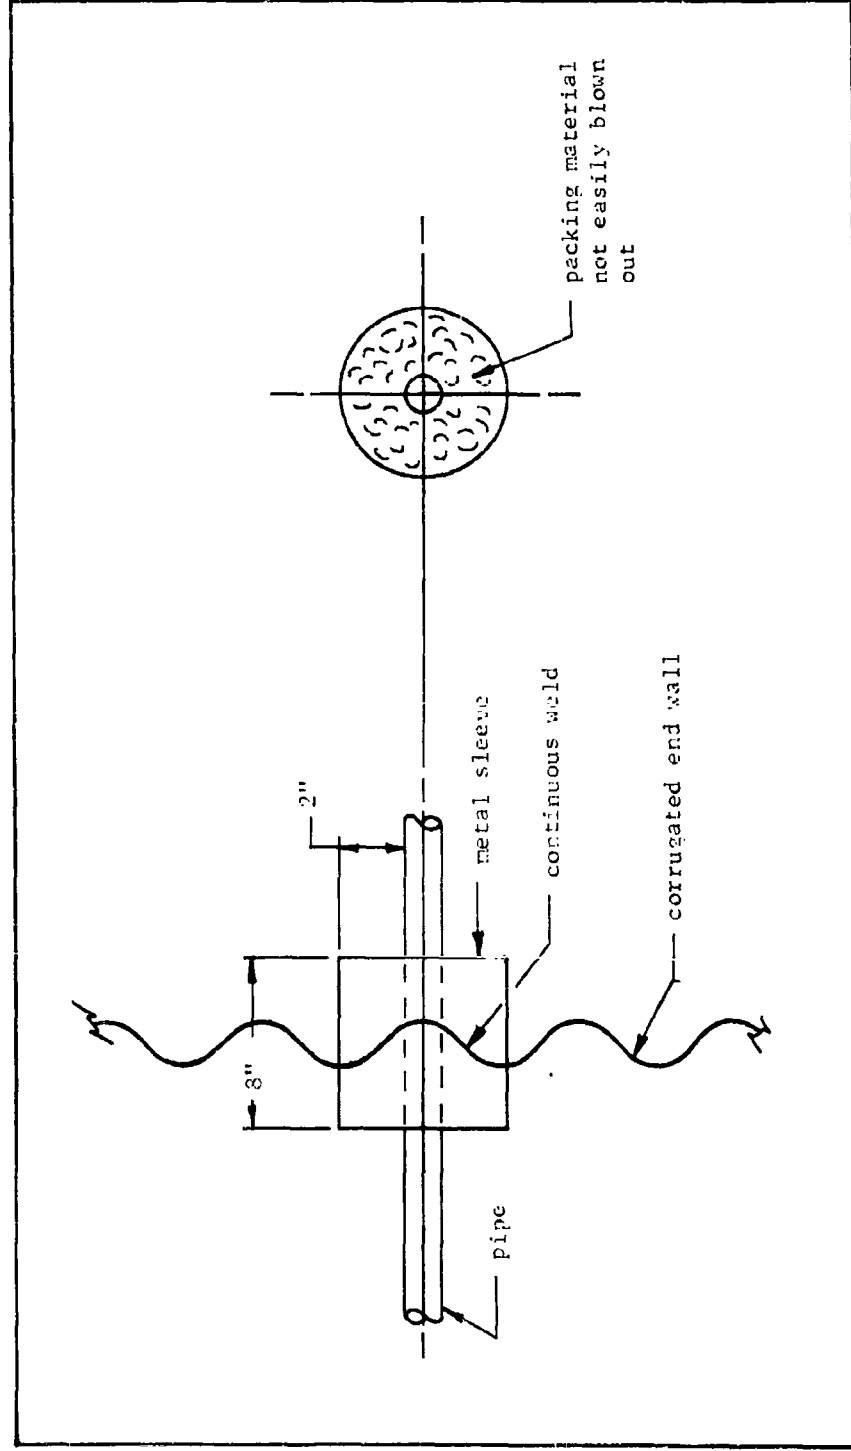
Flexible connection for pipe through wall and wall of Plumbbob 3.3a structure (reference 1).
